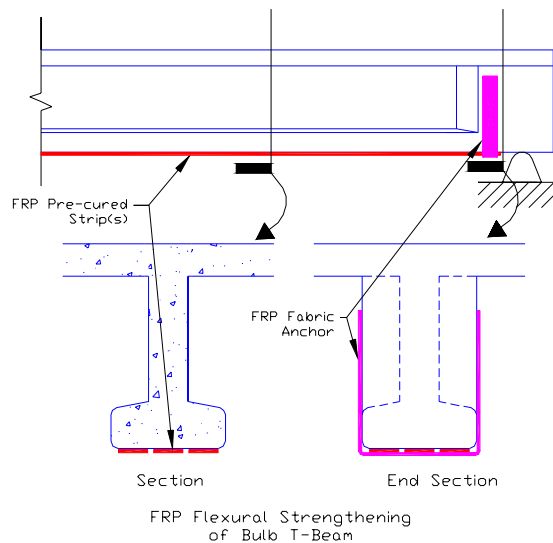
Typical flexural strengthening of AASHTO-type girder bridge
